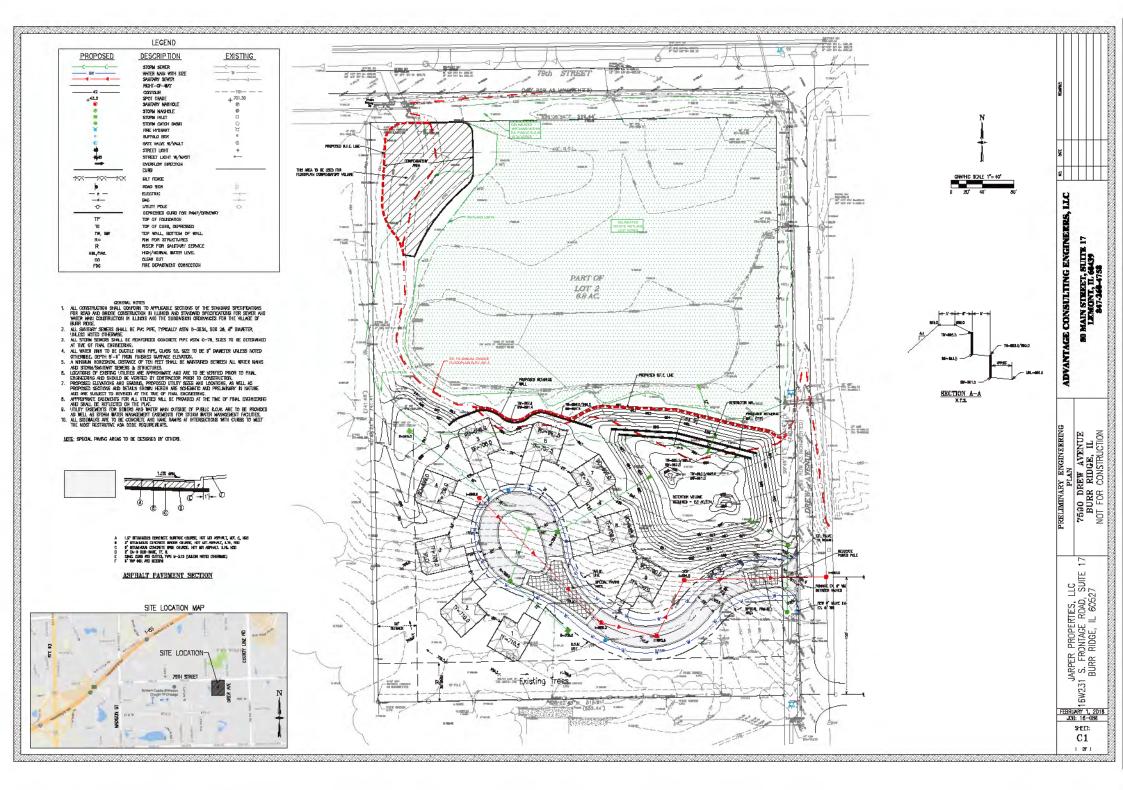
Drew Avenue ^{Burr Ridge, IL}
